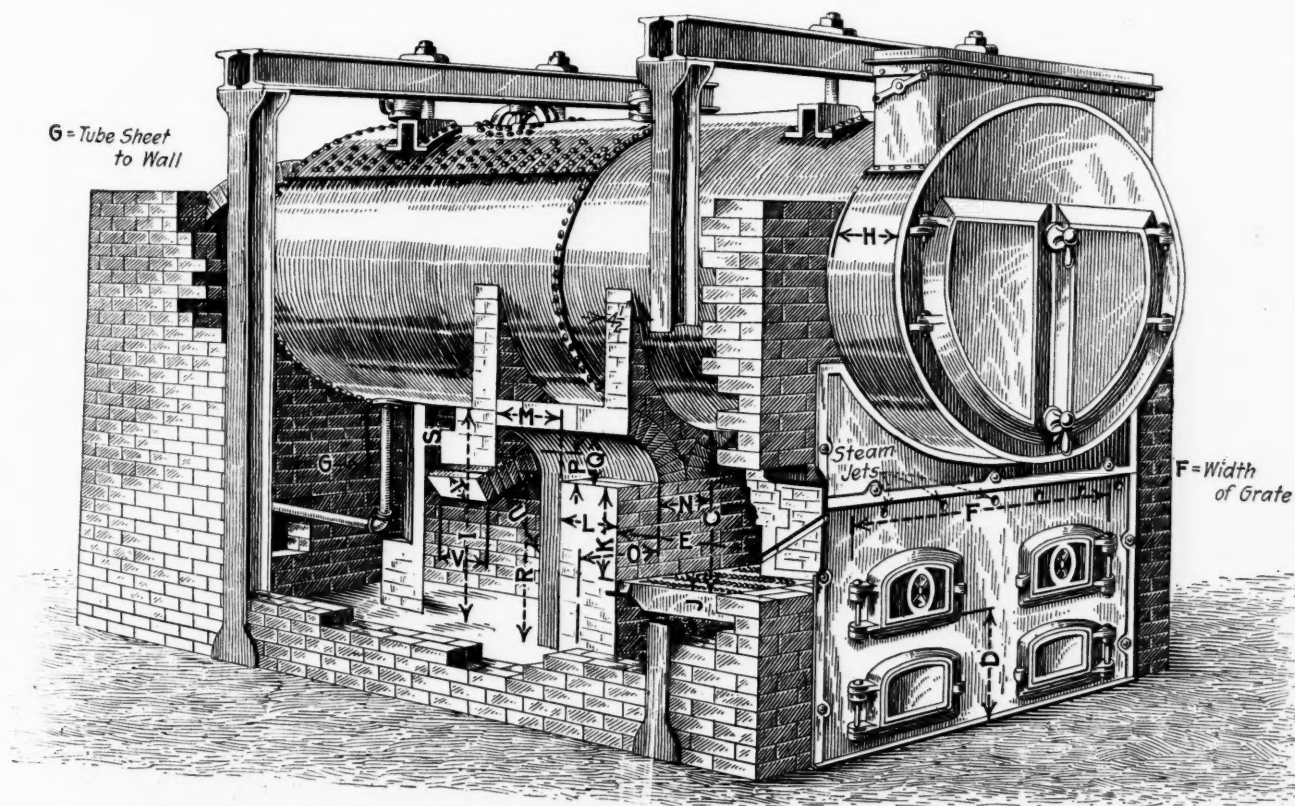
IMPROVED TYPE OF SETTING RECOMMENDED FOR HORIZONTAL RETURN-TUBULAR BOILERS
